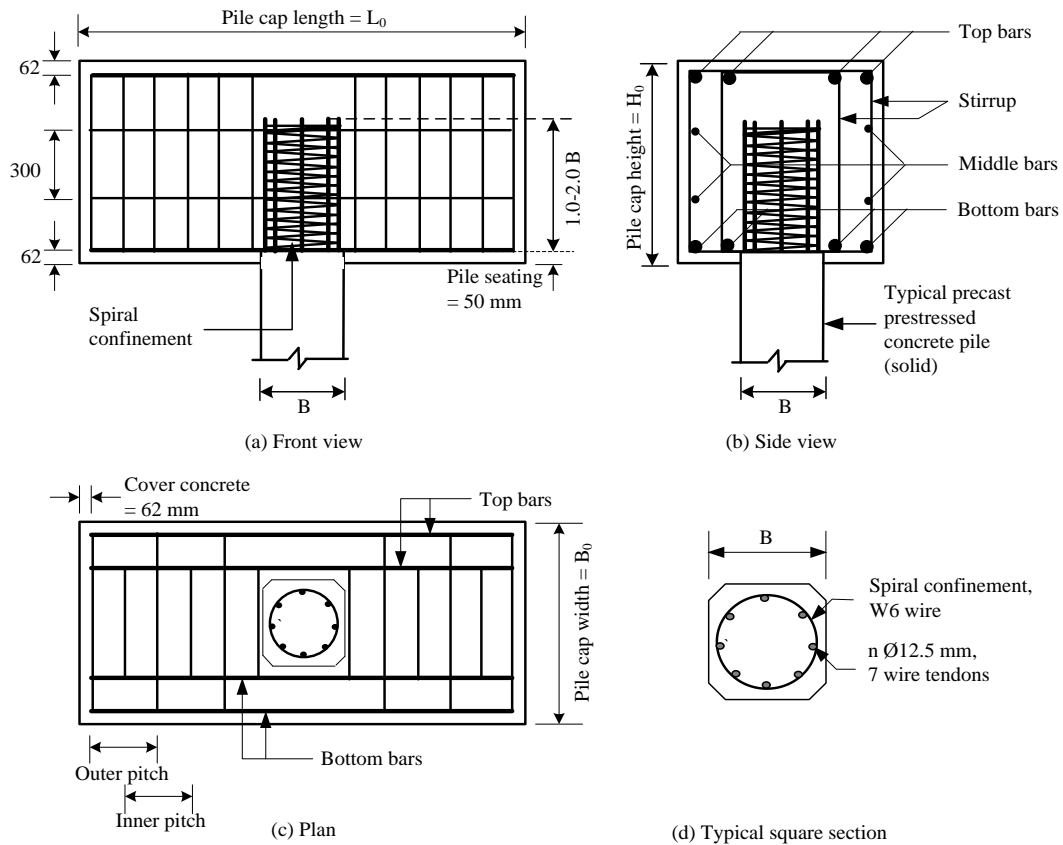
Detail of recommended pile-to-pile cap connection Type-I
